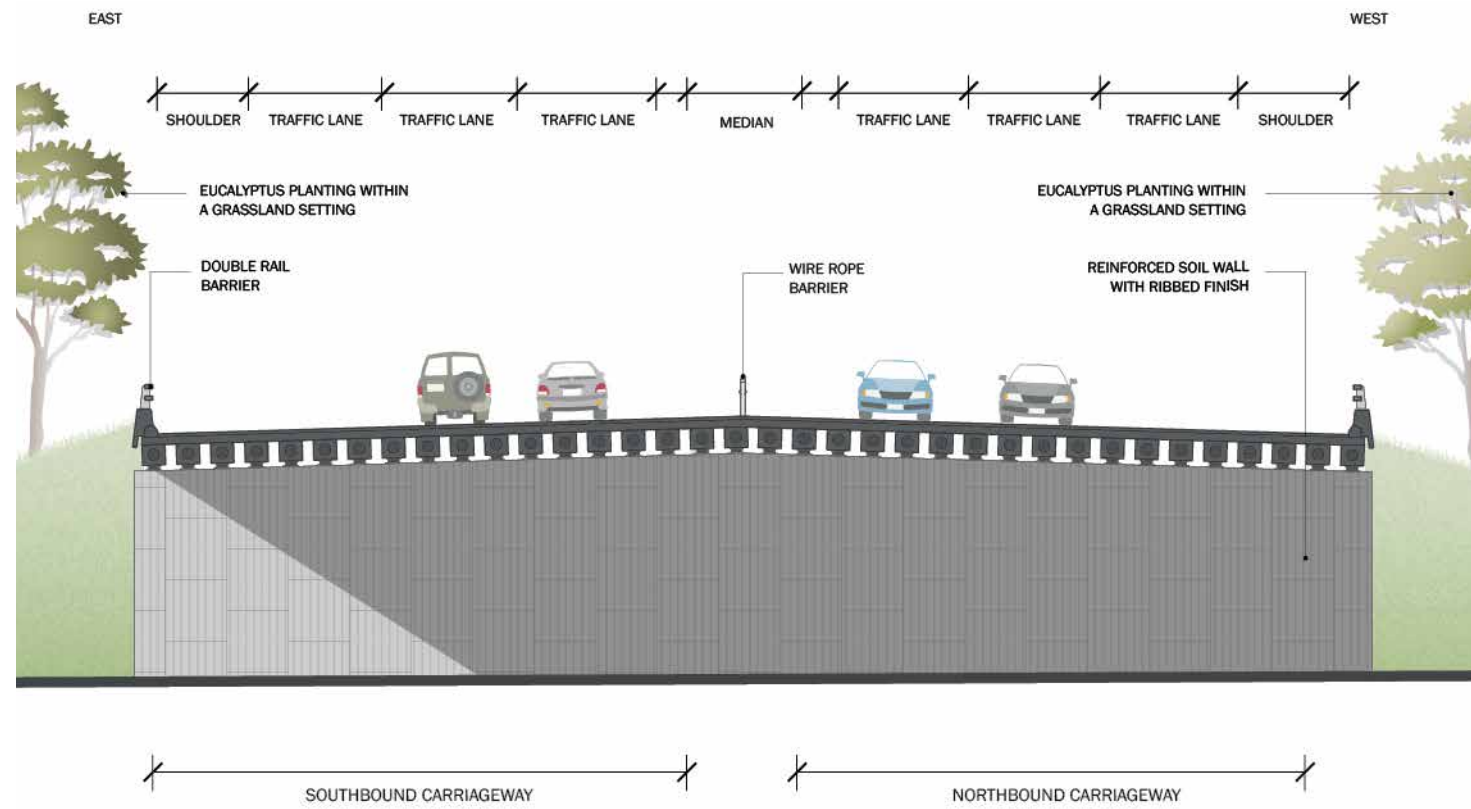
Section – Bridge SB08: Service Road E Underpass (Scale: 1:200@A3)
